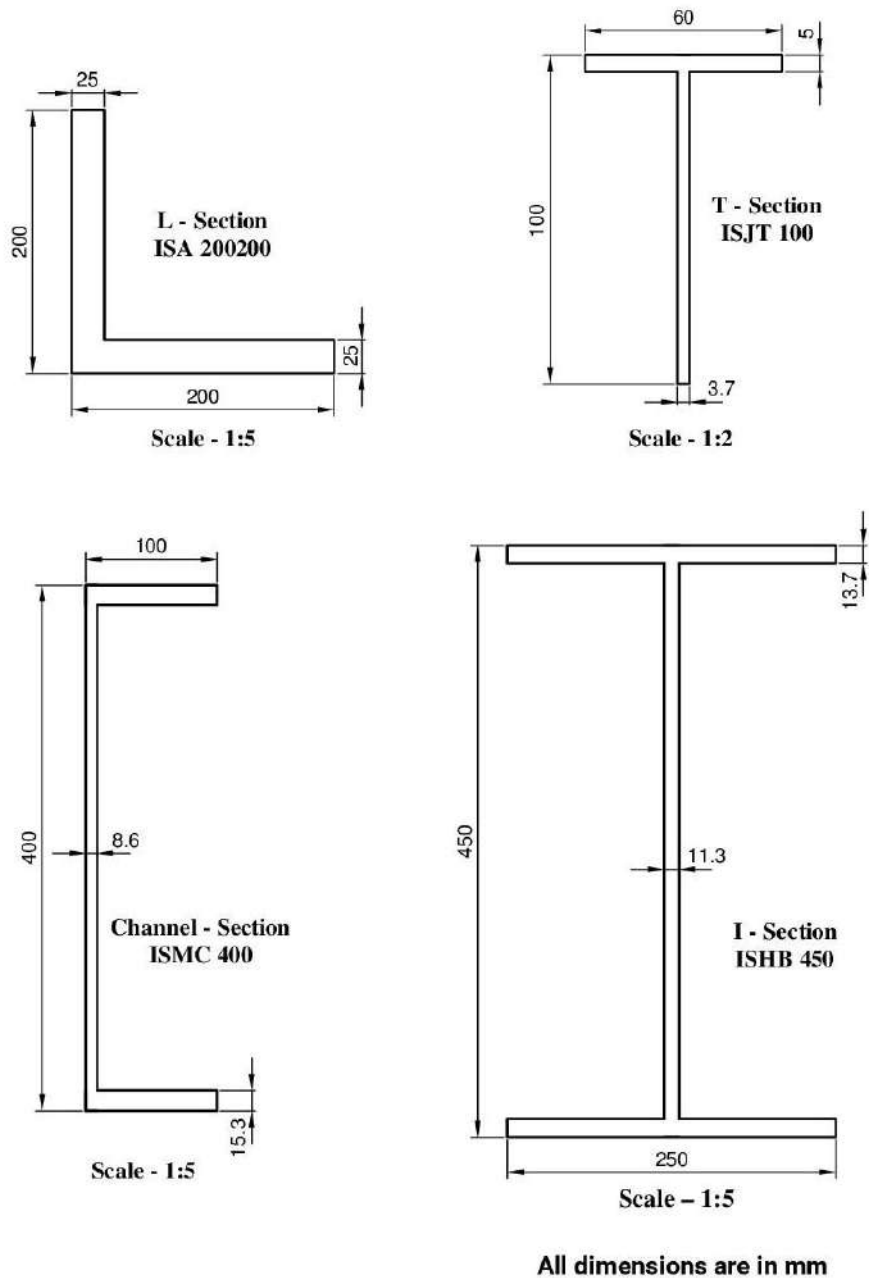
Cross sectional view of L -section, T-section, Channel section and I- Section
